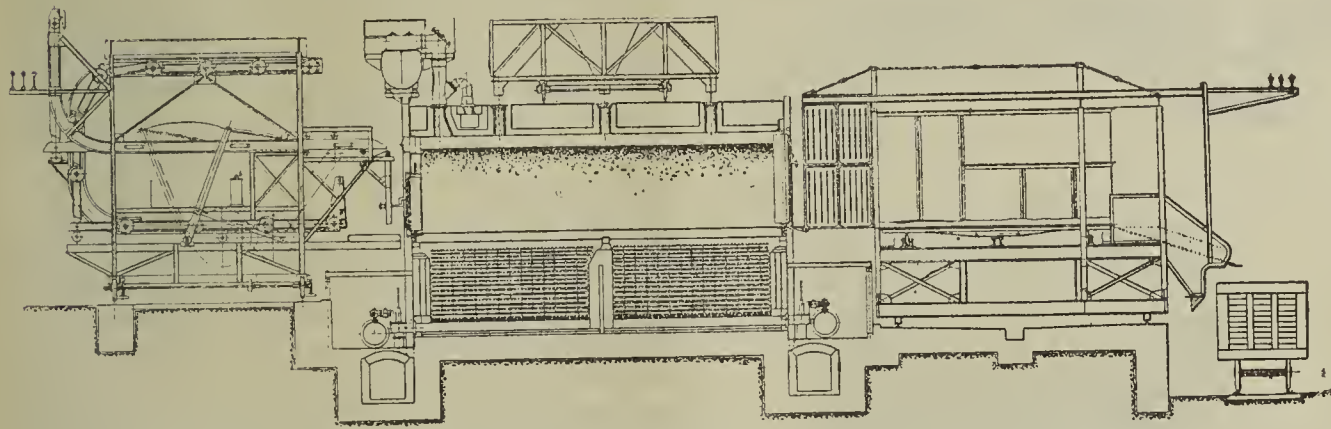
SECTION THROUGH OVEN, SHOWING PUSHING AND LEVELLING MACHINE, COAL-CHARGING MACHINE, AND COKE-QUENCHING MACHINE, AS ADOPTED AT BIRMINGHAM.
